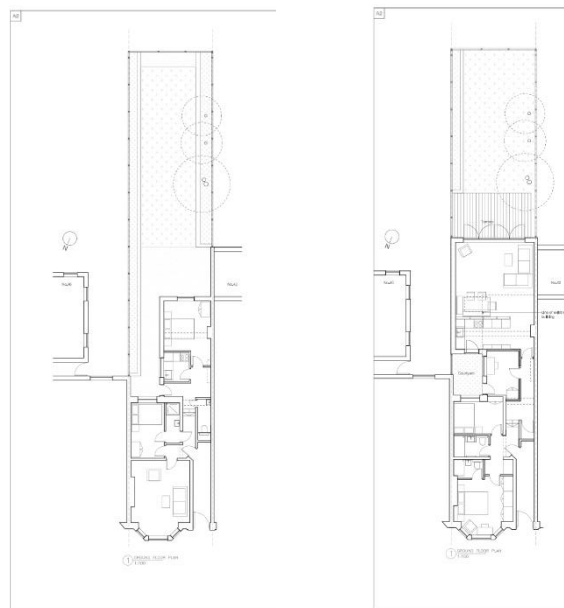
Existing (Left) and proposed (Right) approved floor plans at 44 Iverson Road, similar to our proposal
